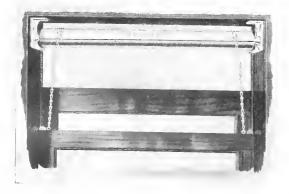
Universal Roller Sash Balance and Chain Connections. Grip Nut Co.
